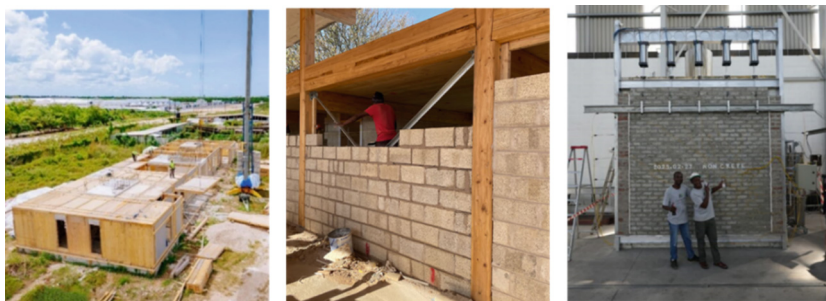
Images of mass timber construction, Hempblock infill walls, and nonCrete test wall (from left to right).
